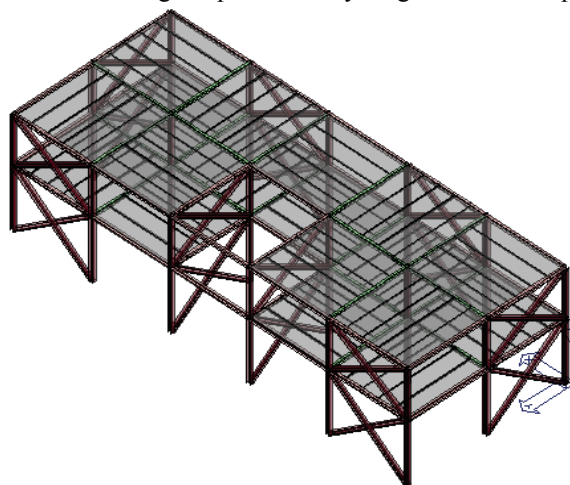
Structural FEM model used for steel and glued laminated timber structures.
